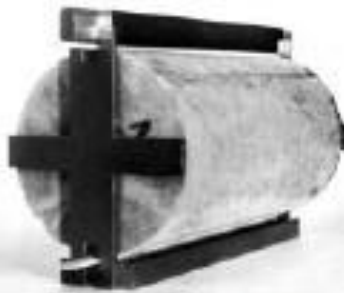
Jig for Aligning Concrete Cylinder and Bearing Strips
